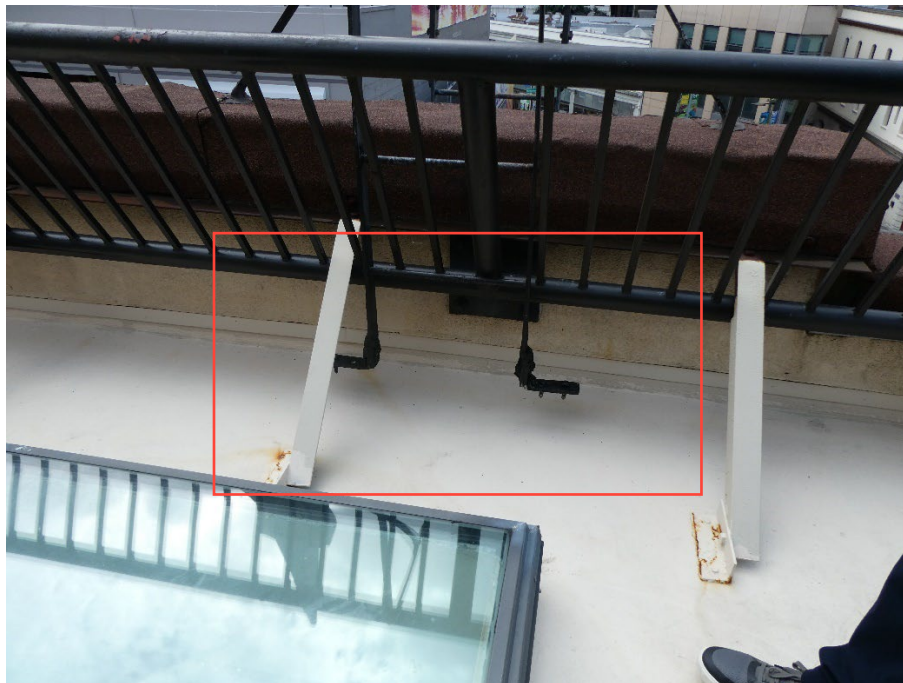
Fire escape is no longer anchored to the roof, fifth floor balcony.
